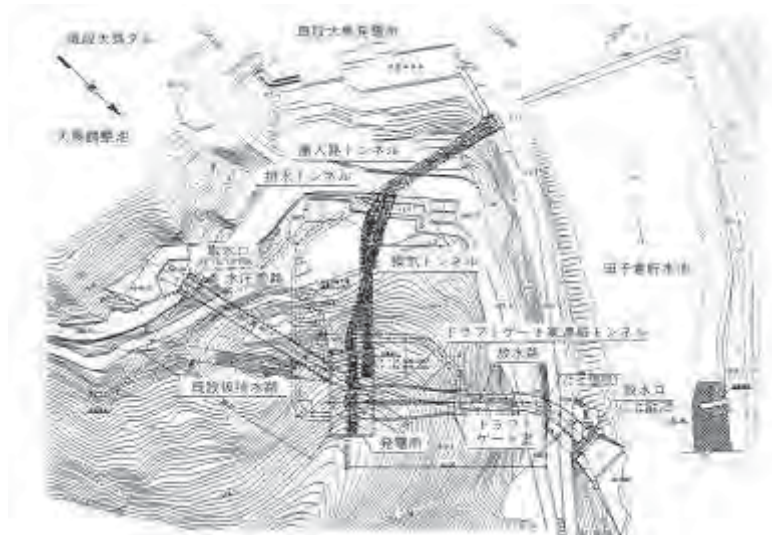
Plan view of the planned expanded Ohtori Power Station
